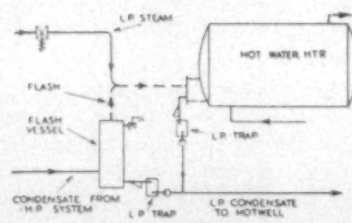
Flash steam system used for heat exchanger with steam coil.
